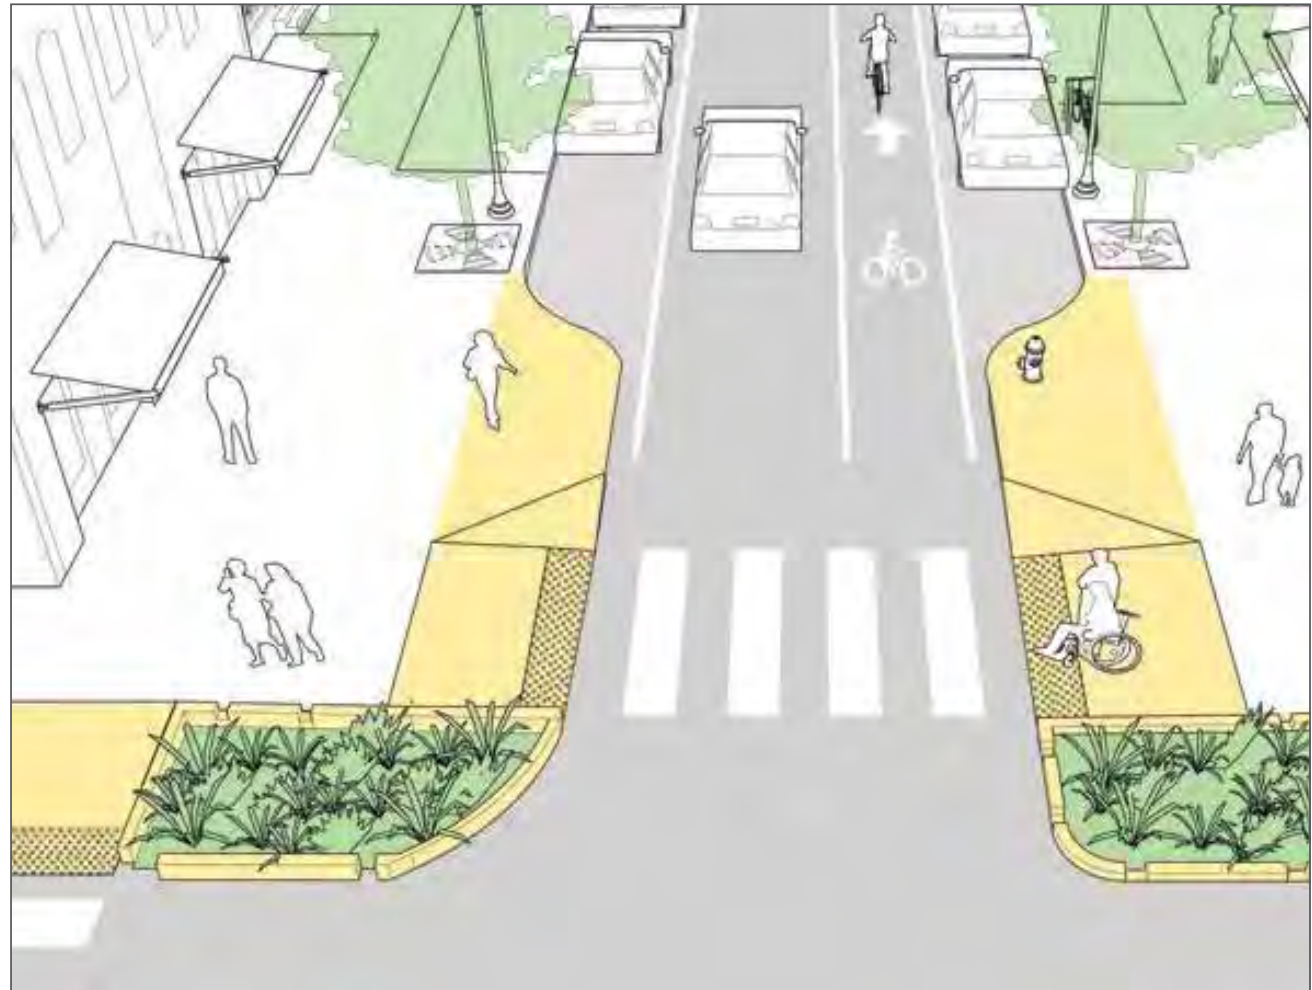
Traffic Calming Curbed Sidewalk Extension at Local Roads
